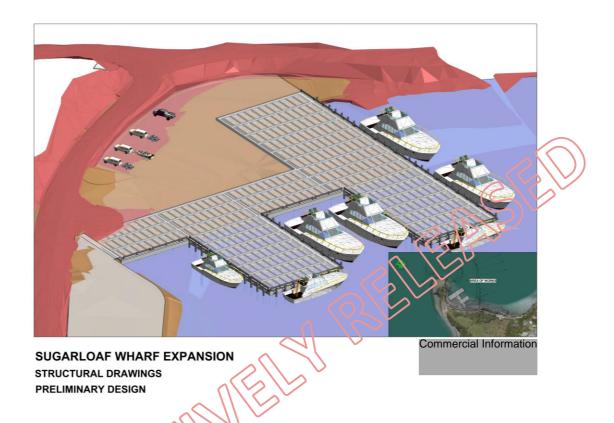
3D structural drawing & layout plan of proposed Sugarloaf Wharf Development. Prepared by Commercial Information
